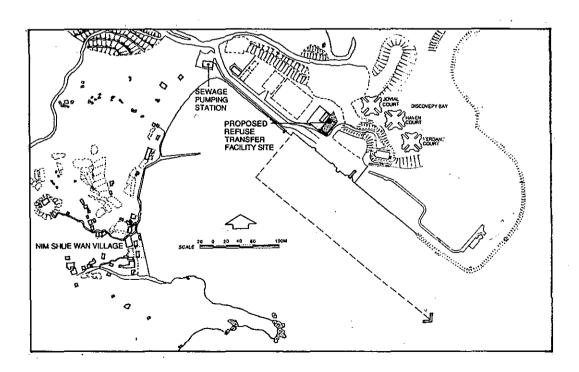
DISCOVERY BAY TRANSFER FACILITY LOCATION PLAN
